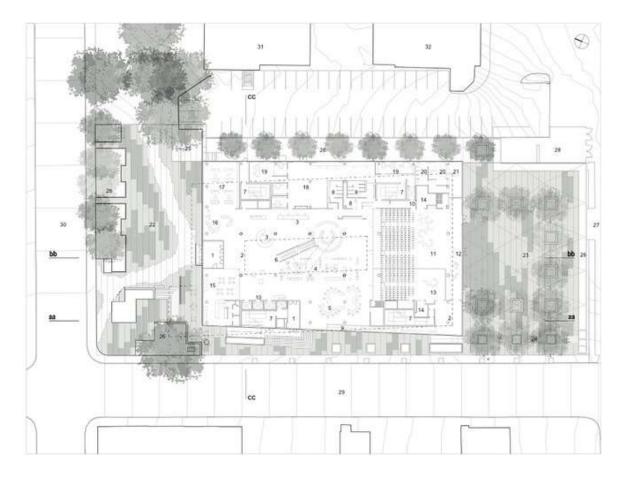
Site plan of the Halifax Public Library (2014) © Schmidt Hammer Lassen architects with Fowler Bauld & Mitchell
